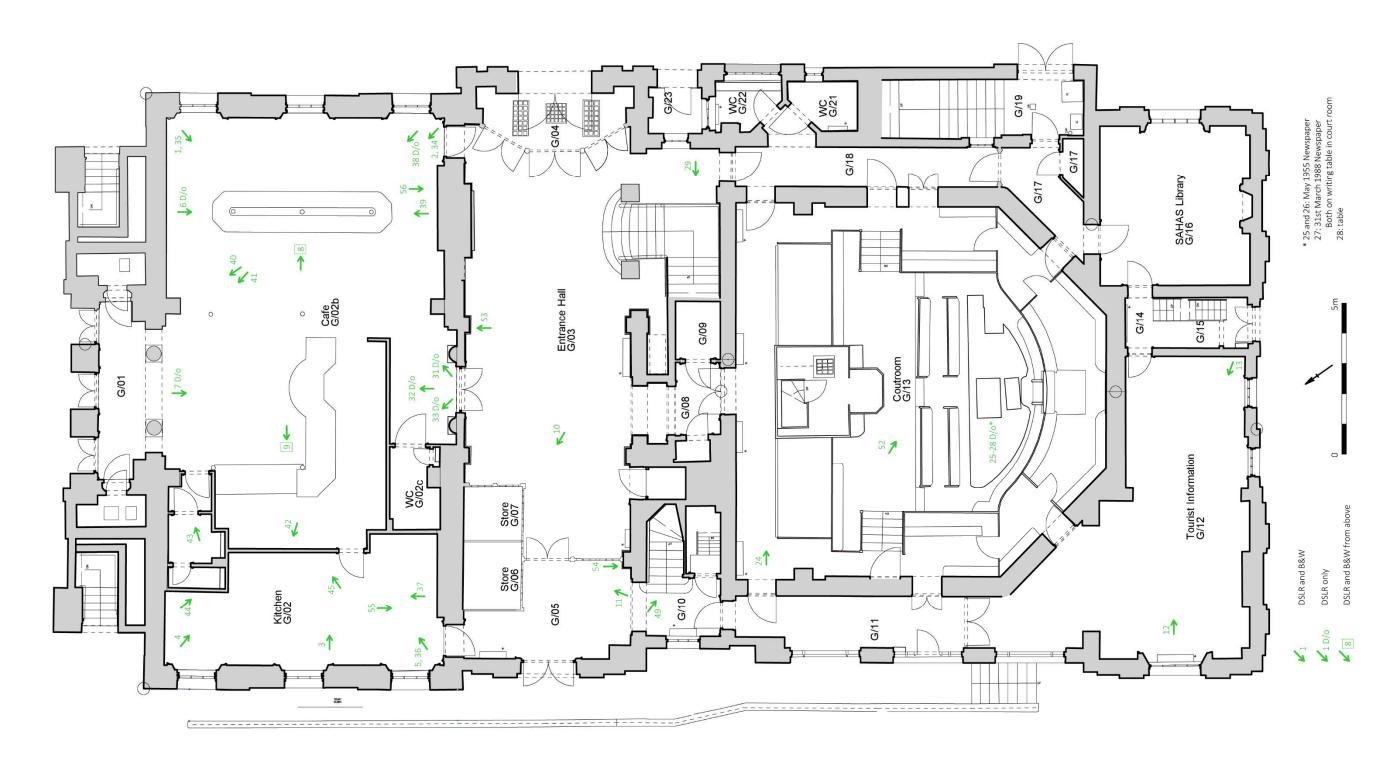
Ground floor Watching Brief photo plan (scale 1:125)
